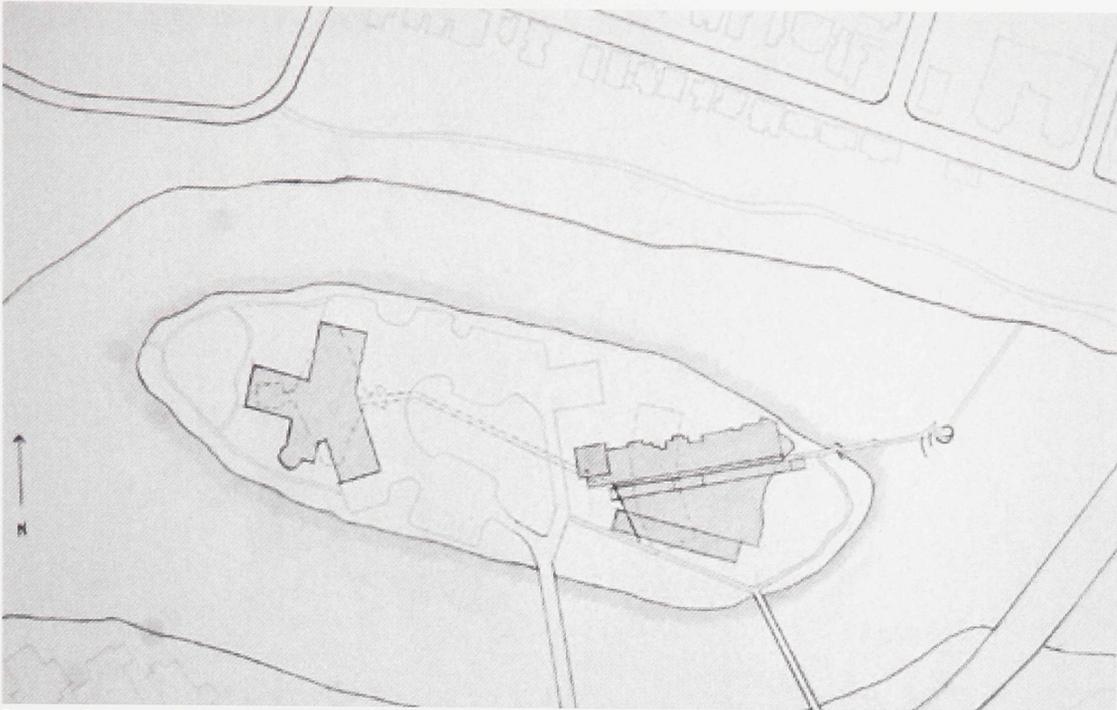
preliminary site plan – the Gary J. Armstrong building is to the left with the new independent living community to the right – they would be connected through an underground tunnel (shown in dotted lines) – the living units face the Edinburgh community
